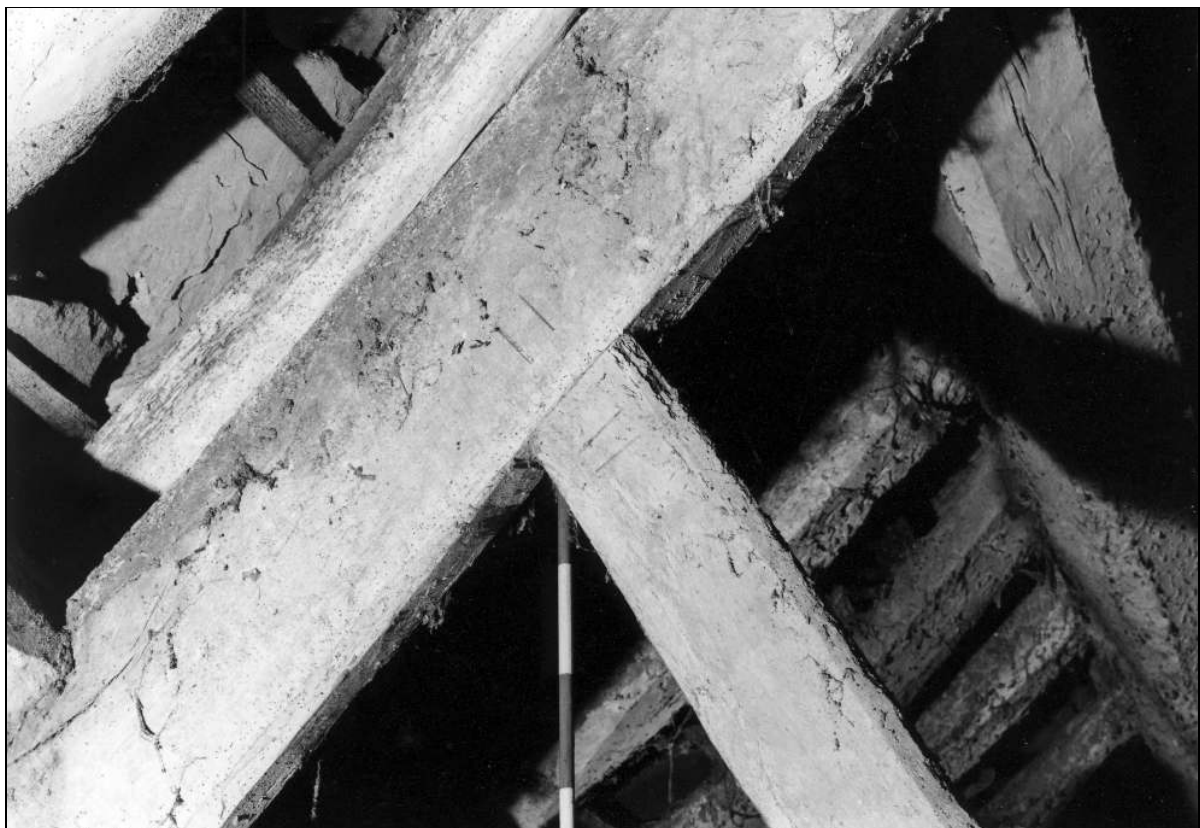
Barn interior: detail of joint numbering on south-west roof truss, from the east (film 5, frame 17)
